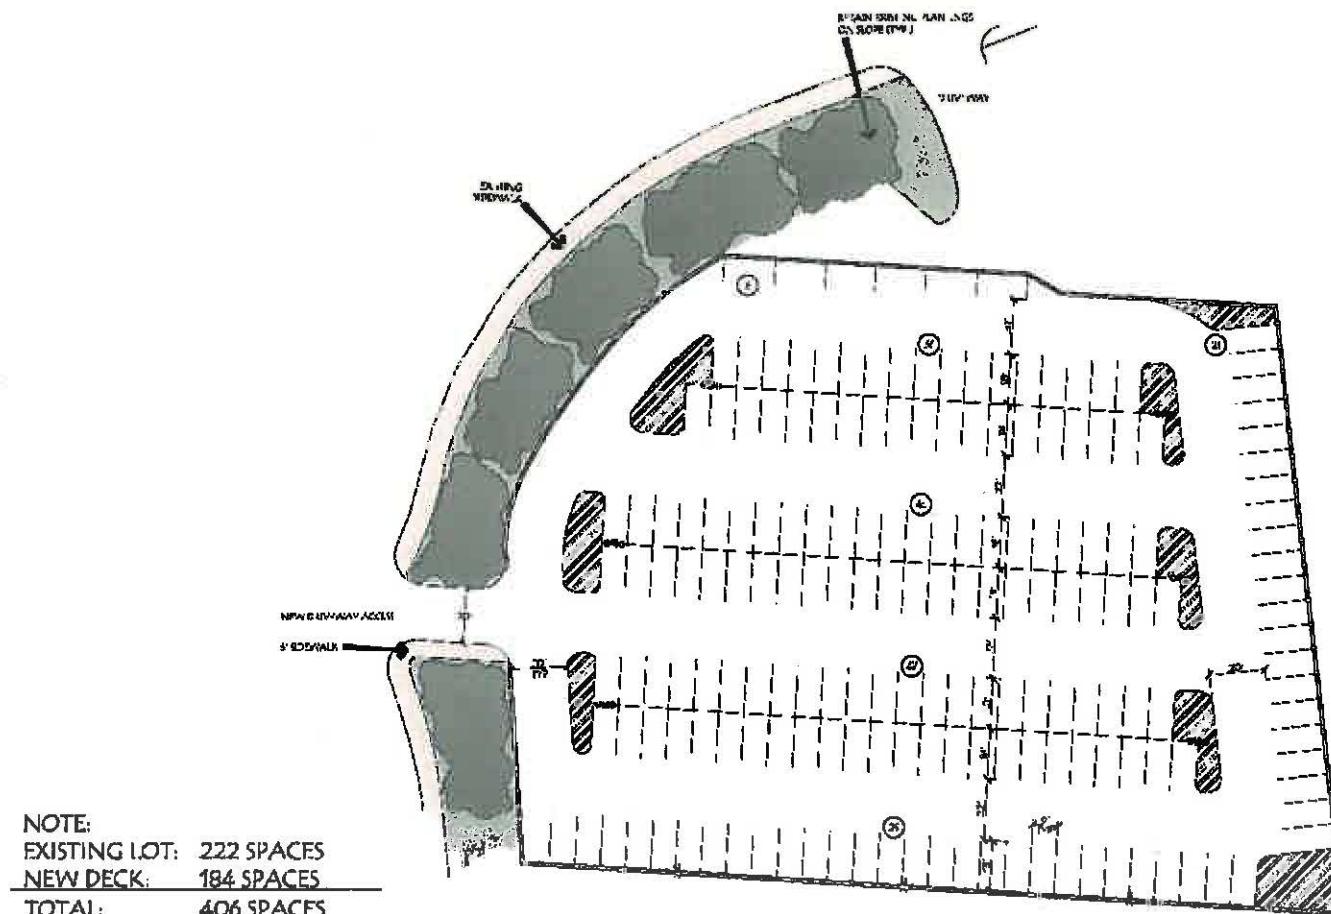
A: Tailby Parking Lot Conceptual Improvement Plan - Alternative 1
